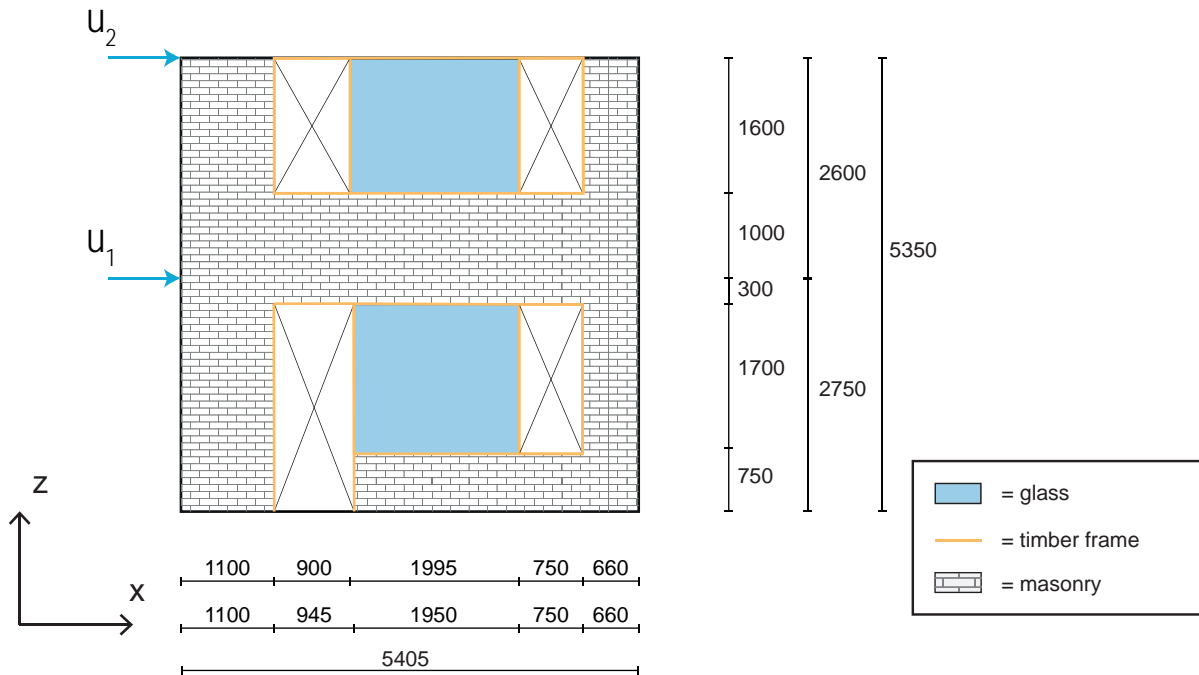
Build-up of the strengthened model used for the terraced house with openable window sections.
